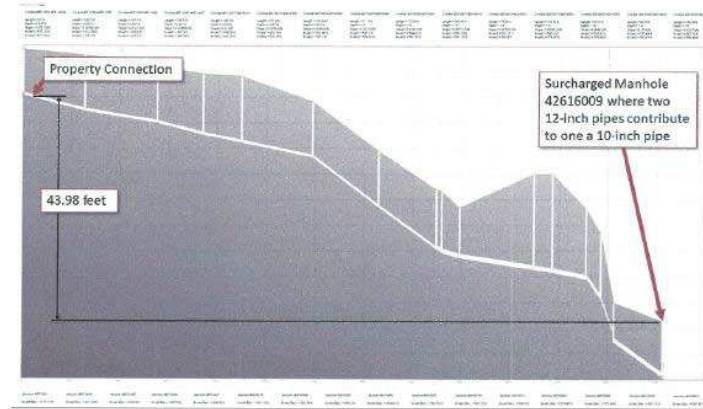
Hydraulic profile showing steep pipes on the hillsides upstream of manhole 42916009.
